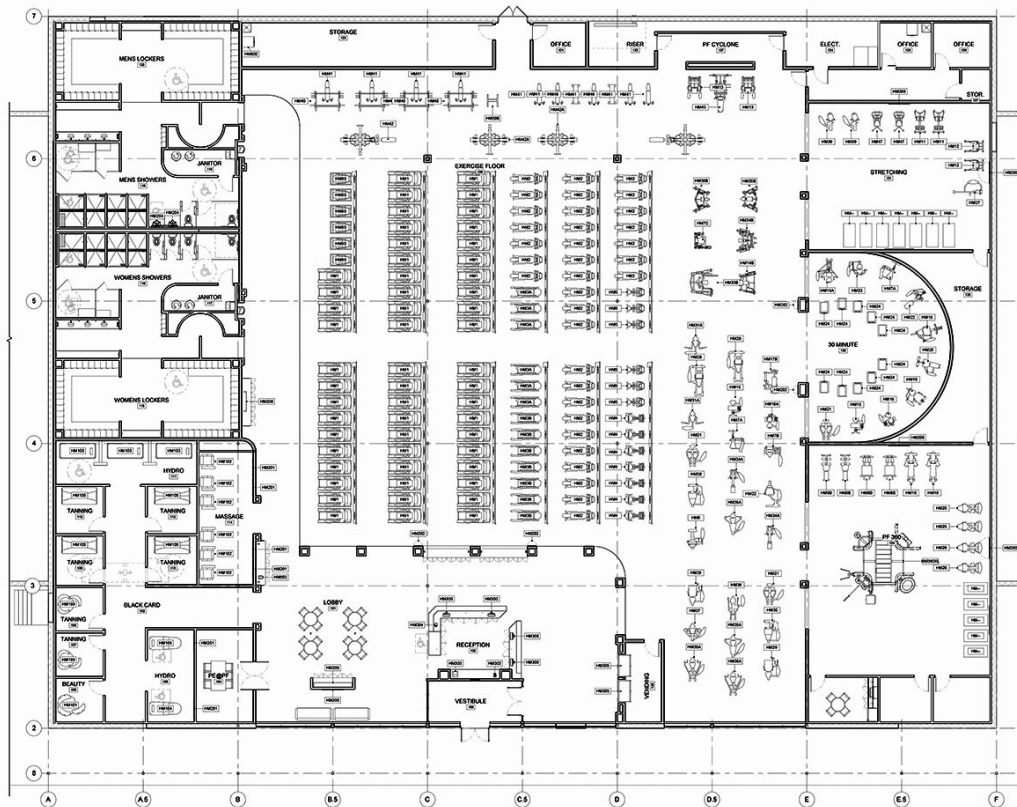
Floor Plan of a typical Planet Fitness gym facility
